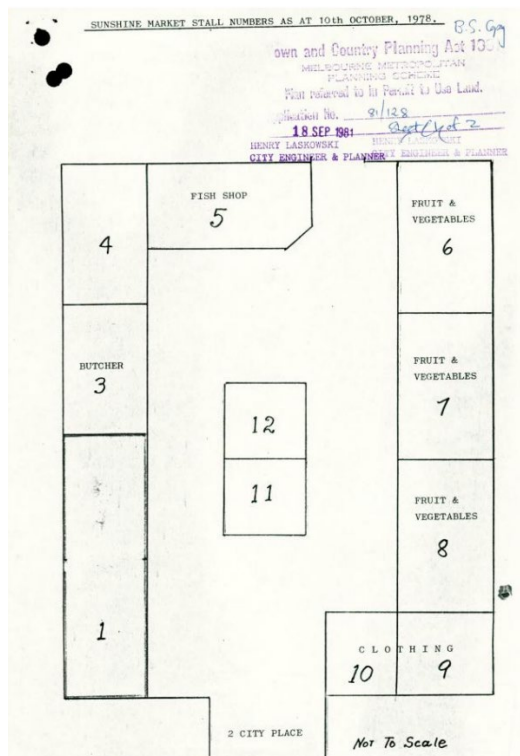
Stall layout in the market hall, 1981 (Supplied with application).
